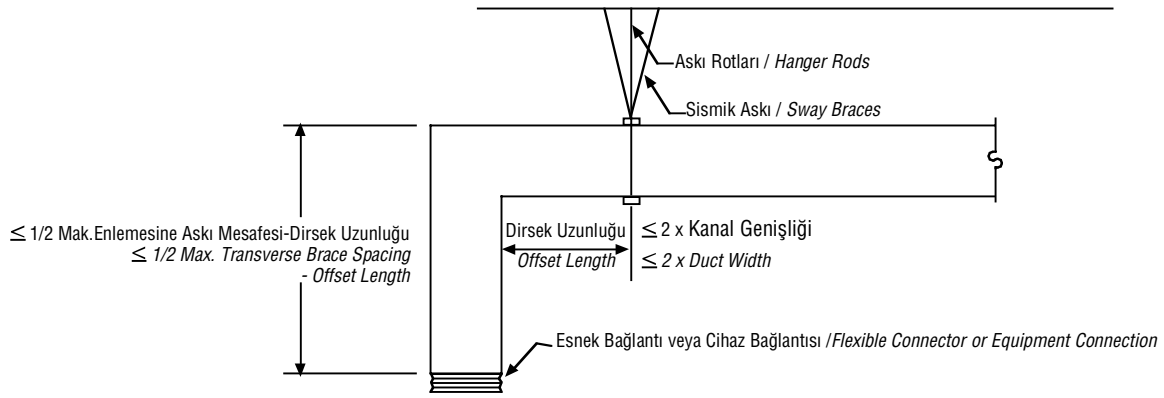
Bracing of Duct drop to equipment supported on floor.
